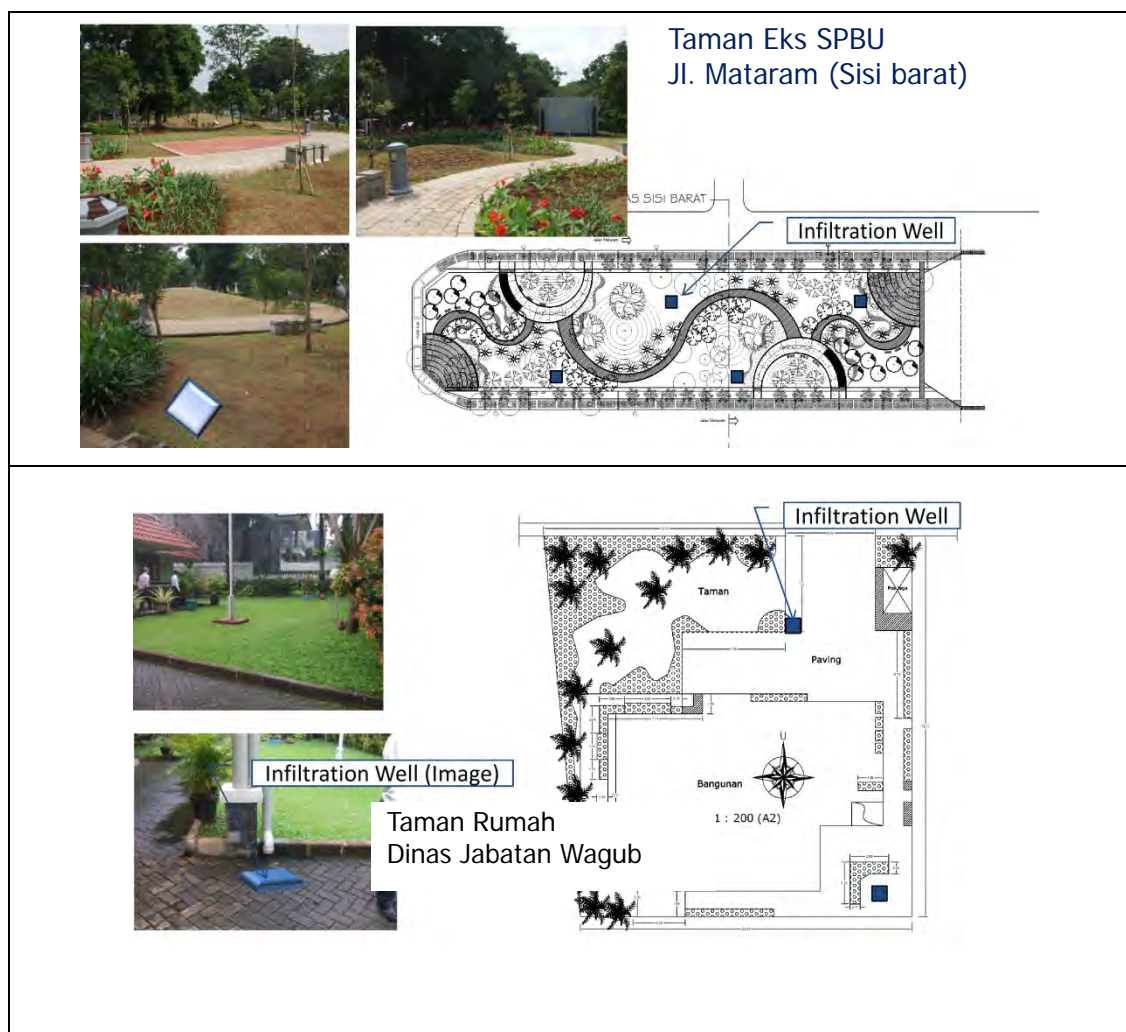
Layout of Infiltration Facility in Park (Case Study)
